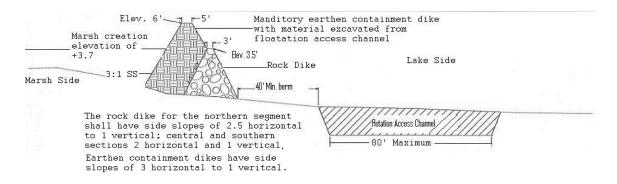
Typical Cross Section of Earthen Containment Dikes and Rock Dikes
